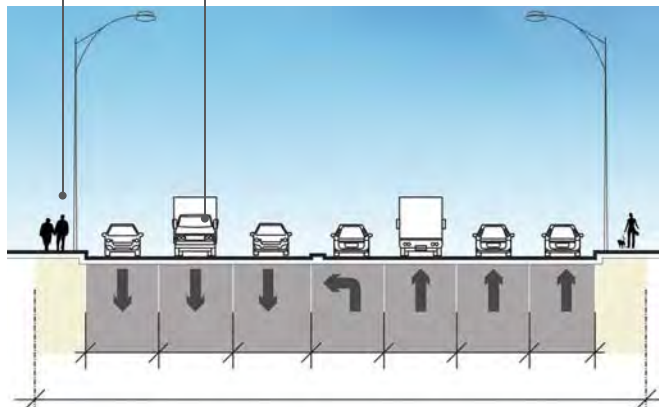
Existing Street Design of 22<sup>nd</sup> Street
